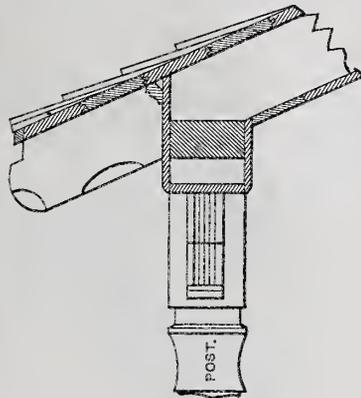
Piazza Ceiling and Rafter.—Scale, 1/2 Inch to the Foot.
